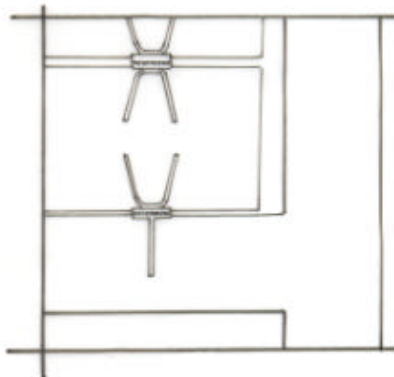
Connection of prefabricated panels to columns and beams [46]
